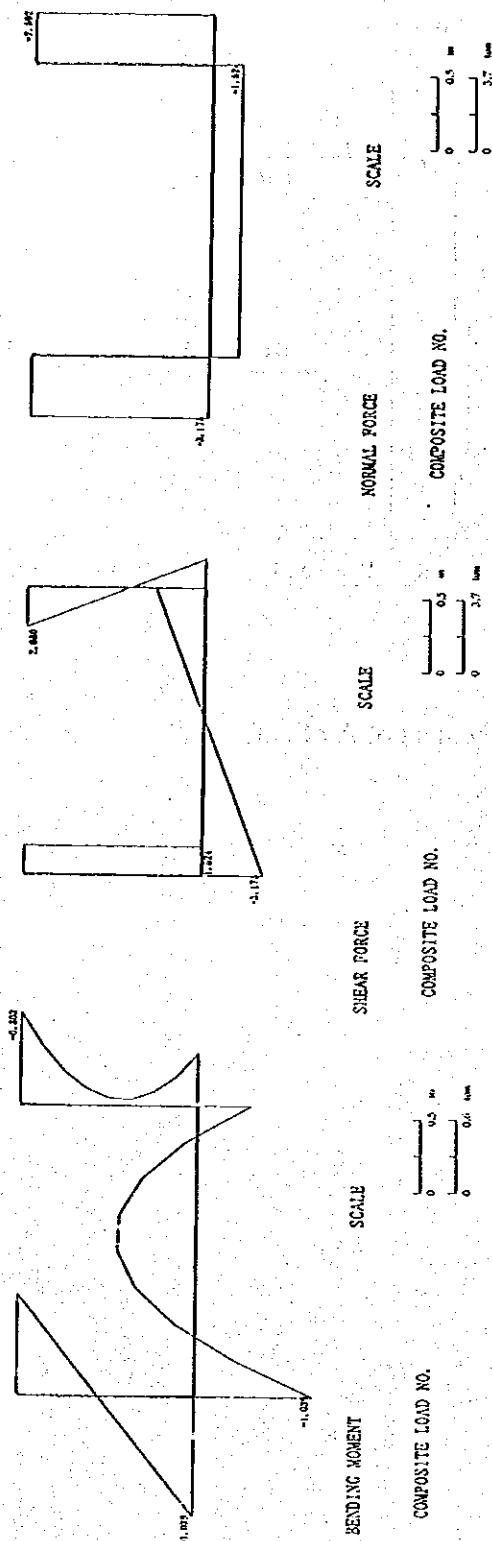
(1/2) Sectional Force (Section A-A : Normal condition)
